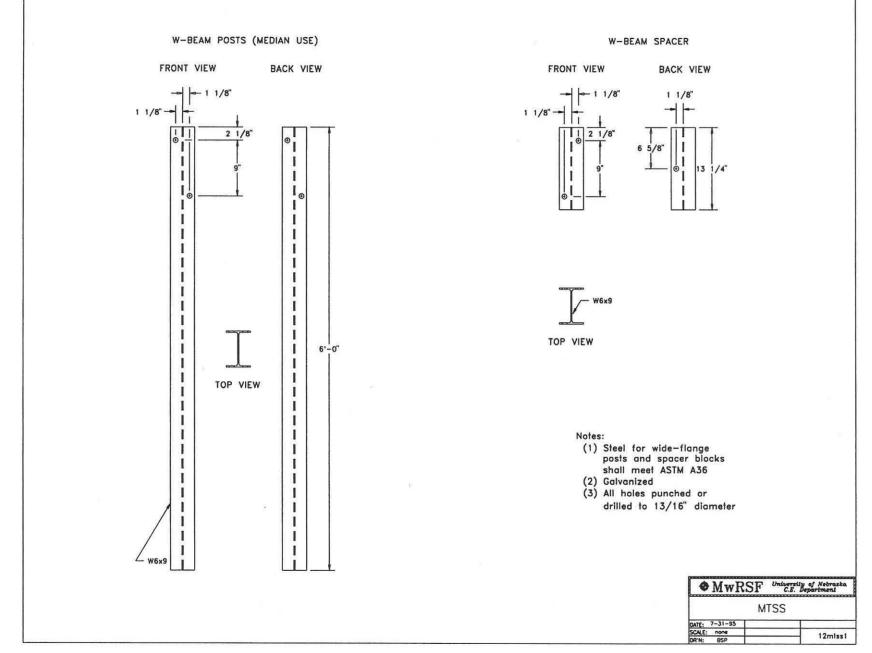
W-Beam Post and Spacer Details, Design No. 1
